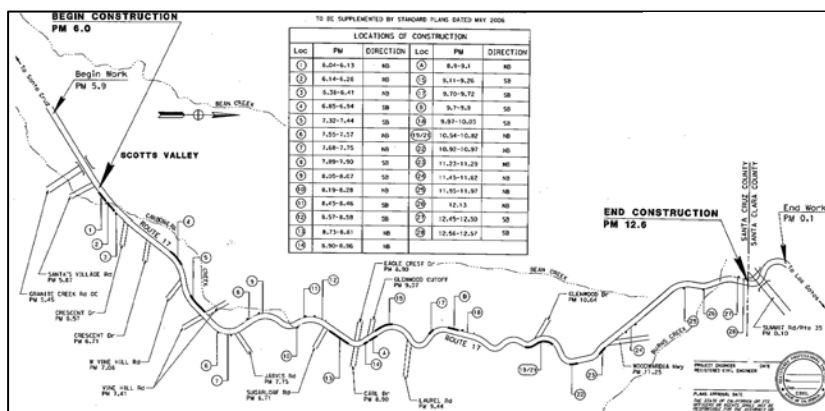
Locations for Guardrail Improvements in Santa Cruz County
